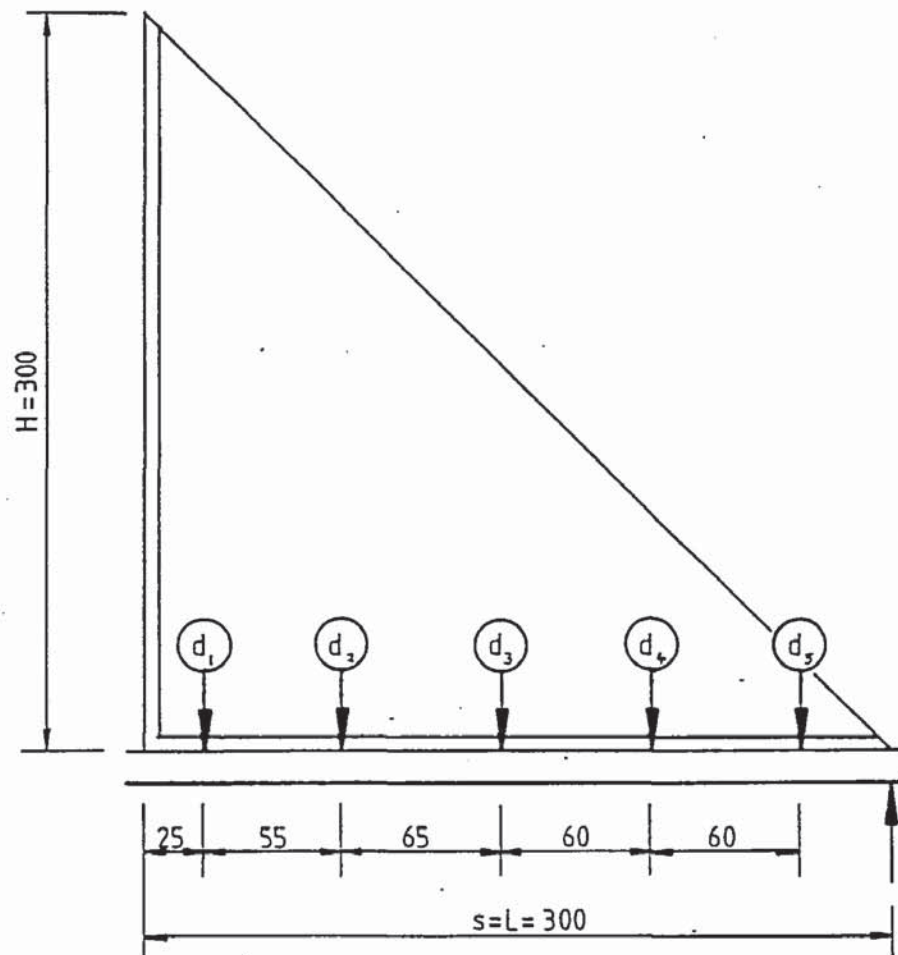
Extra dial gauge positions on loaded plate of specimen S6-300-1.
